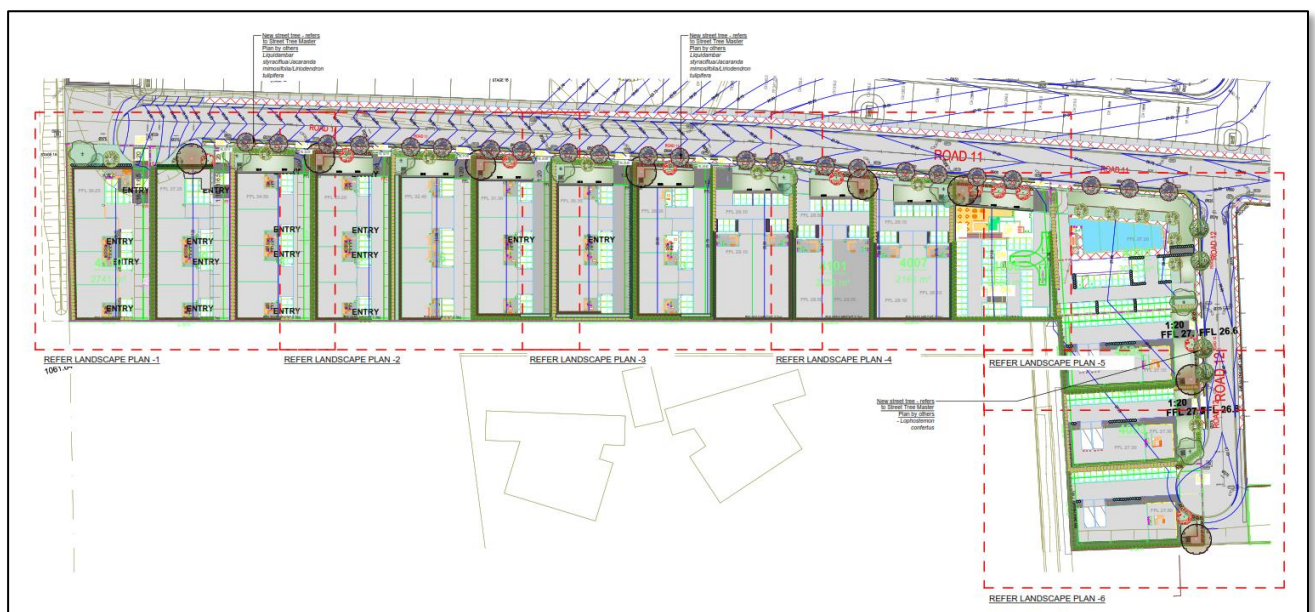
Proposed Landscaping (Source: Extracted from Landscape Plans)
